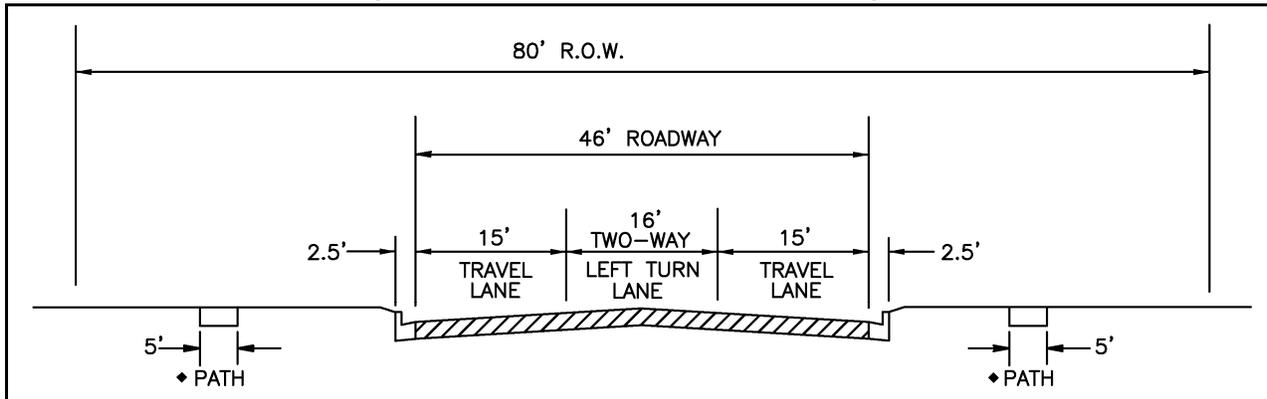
STREET DESIGN STANDARD - RESIDENTIAL COLLECTOR
